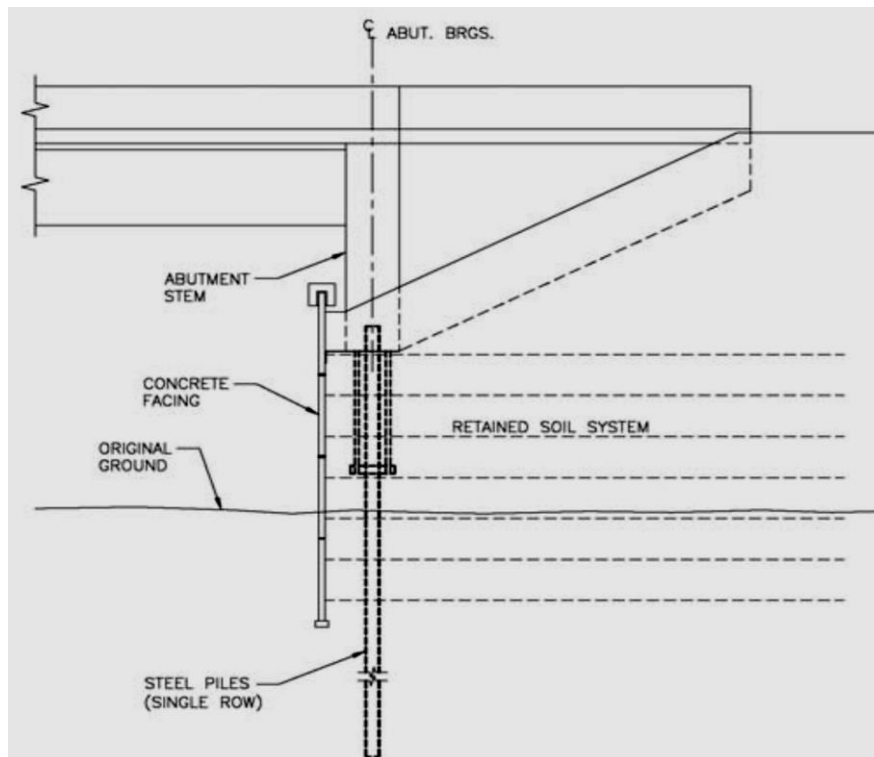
Section of integral abutment showing sleeves around piles and retained soil system in place (Ontario Ministry of Transportation 2008)
